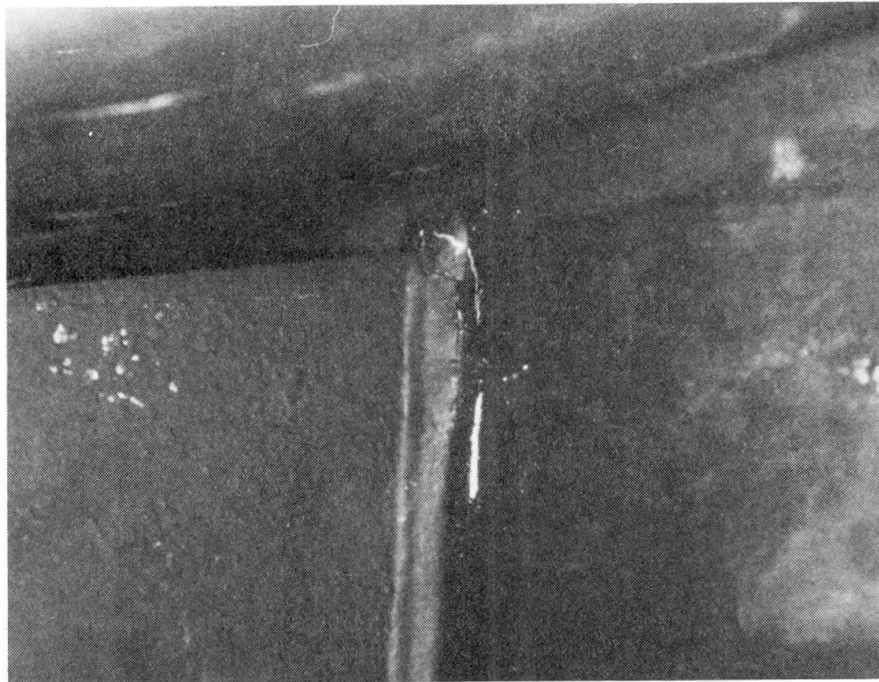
Typical Crack in Transverse Connection Plate-Web Weld
